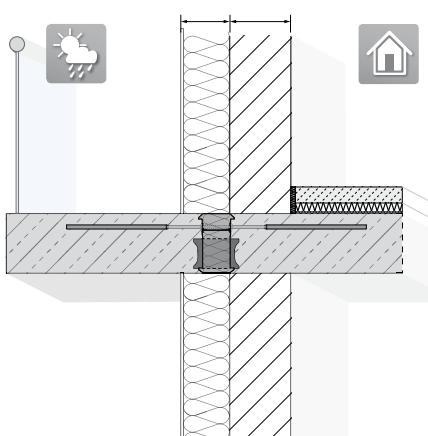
Cross section through a balcony slab with a HALFEN HIT Insulated connection, connected to the main (inner) slab.
